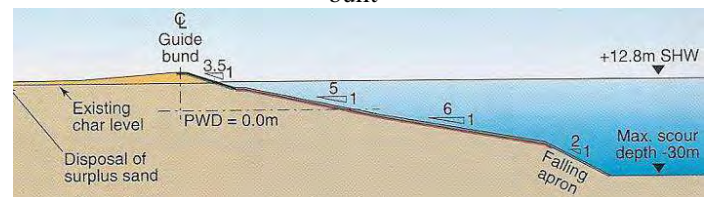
Typical cross-section Jamuna Bridge RTW (after launching of falling apron)
